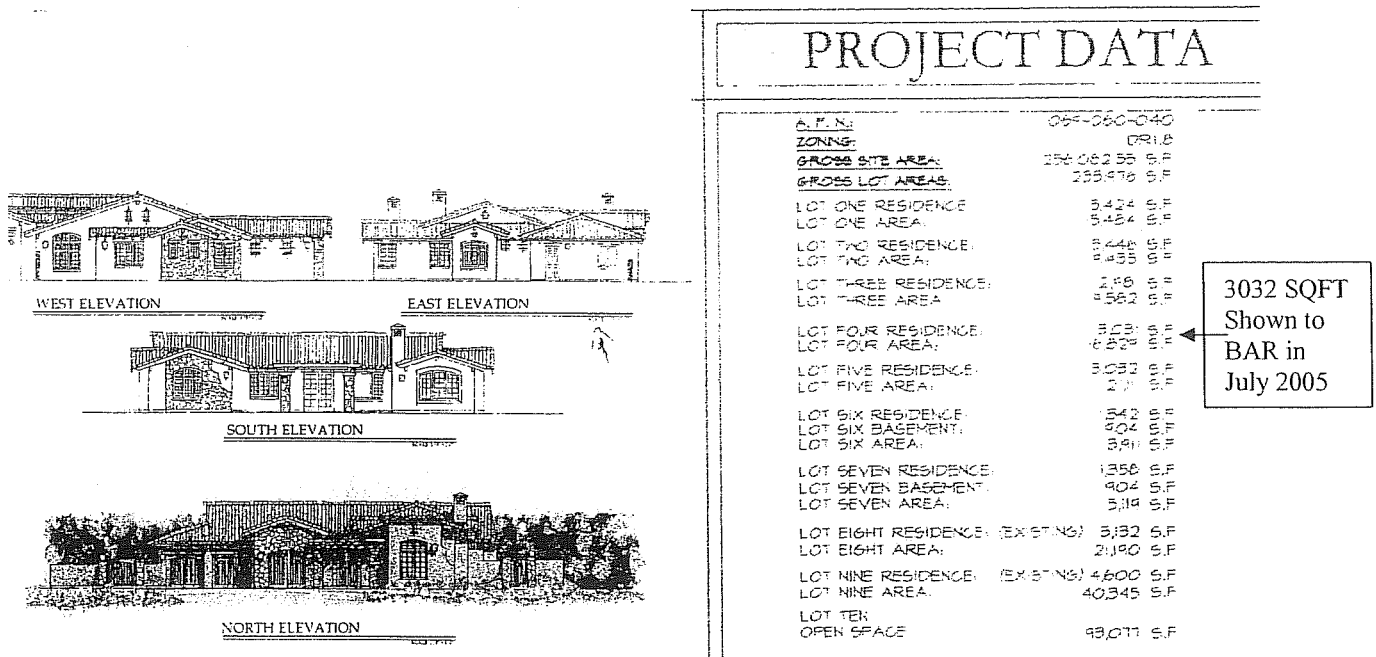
Elevation drawings for Lot 4 shown at BAR meeting in July 2005 and accompanying project data showing the proposed structure at 3032 S.F. No elevated basement plans were presented. With the current plan the size doubles to 6064 S.F.
